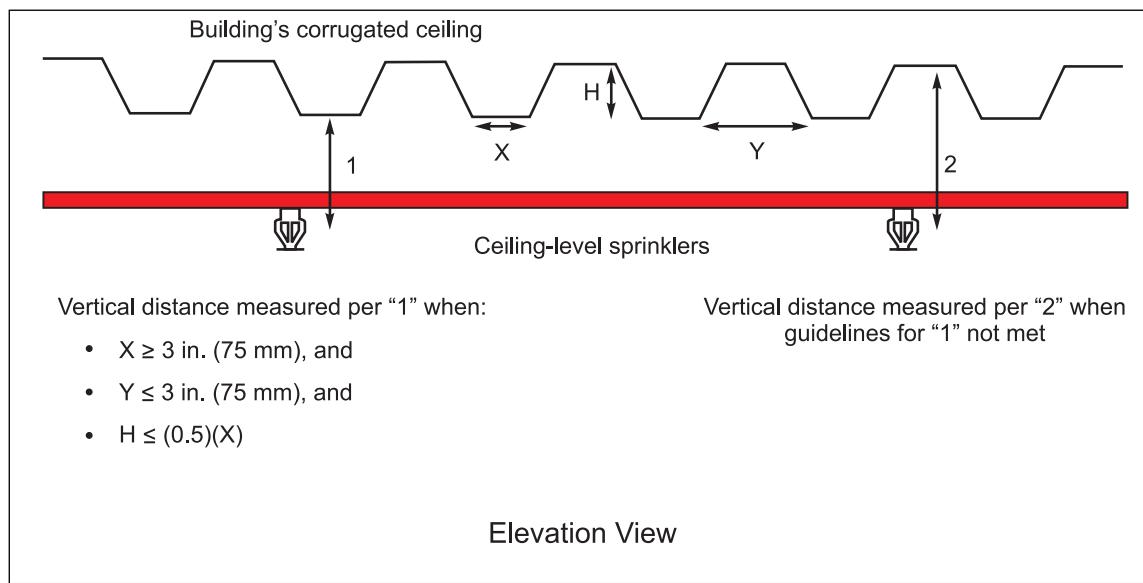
How to measure the vertical distance between the thermal element of Storage sprinklers and the underside of a corrugated ceiling
